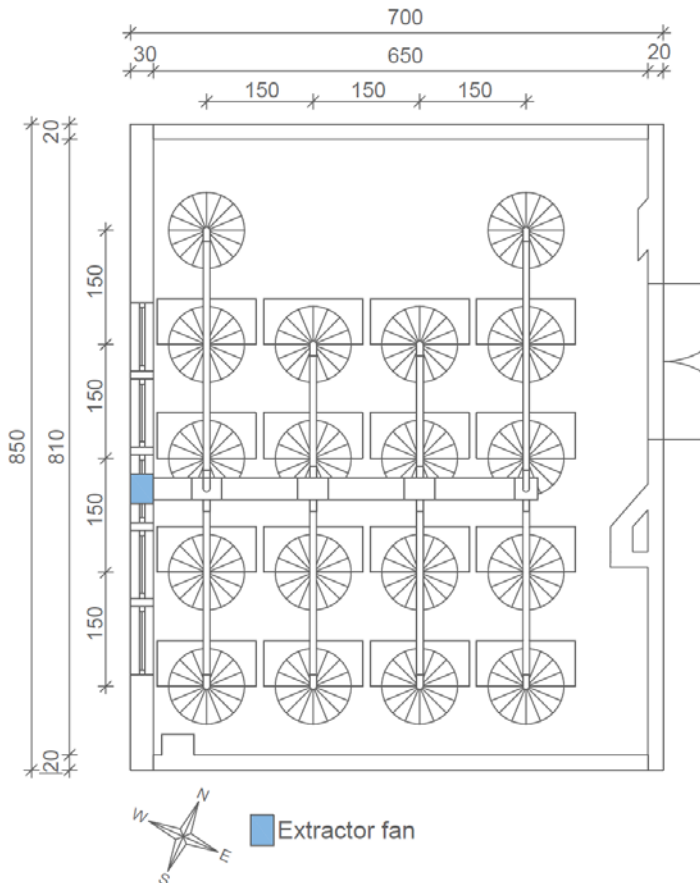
Floor plan of the seminar room showing the layout of the MPIC-MEV system.
